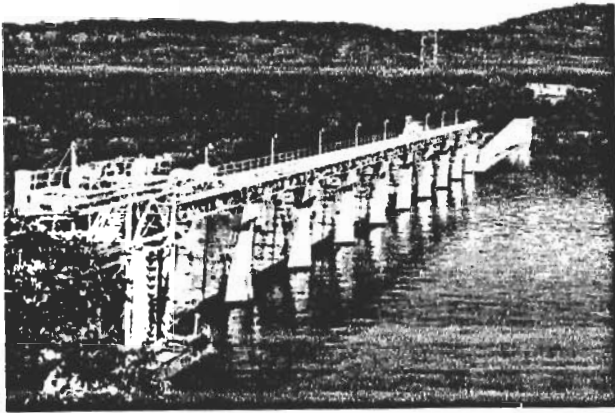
LCRA's Tom Miller Dam on Lake Austin
